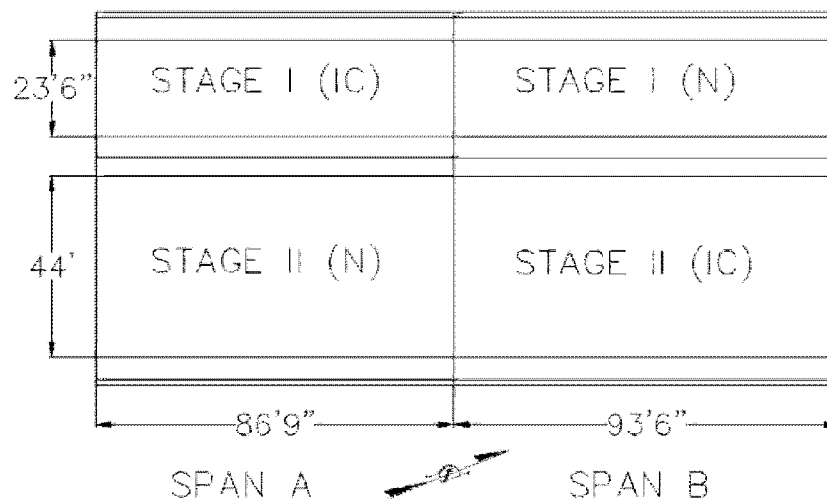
Schematic of bridge deck showing construction stages and denoting conventional normal weight (N) and internally cured (IC) concrete sections.
